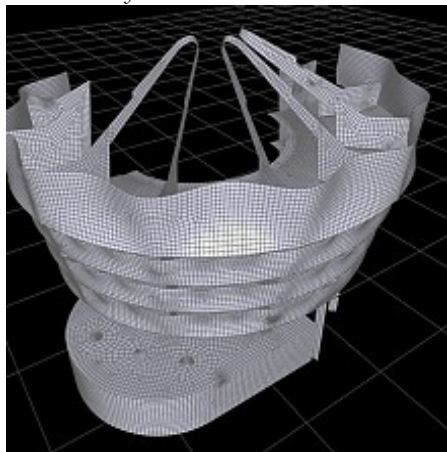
3D rendering showing the most significant deformation of walls on the upper level
